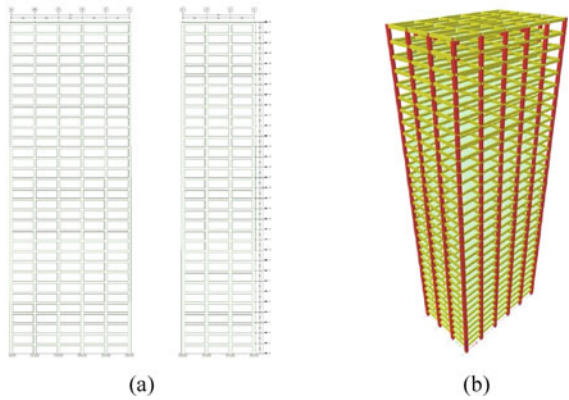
Frame elevation section in the long and short directions (a) and the 3D model (b)
